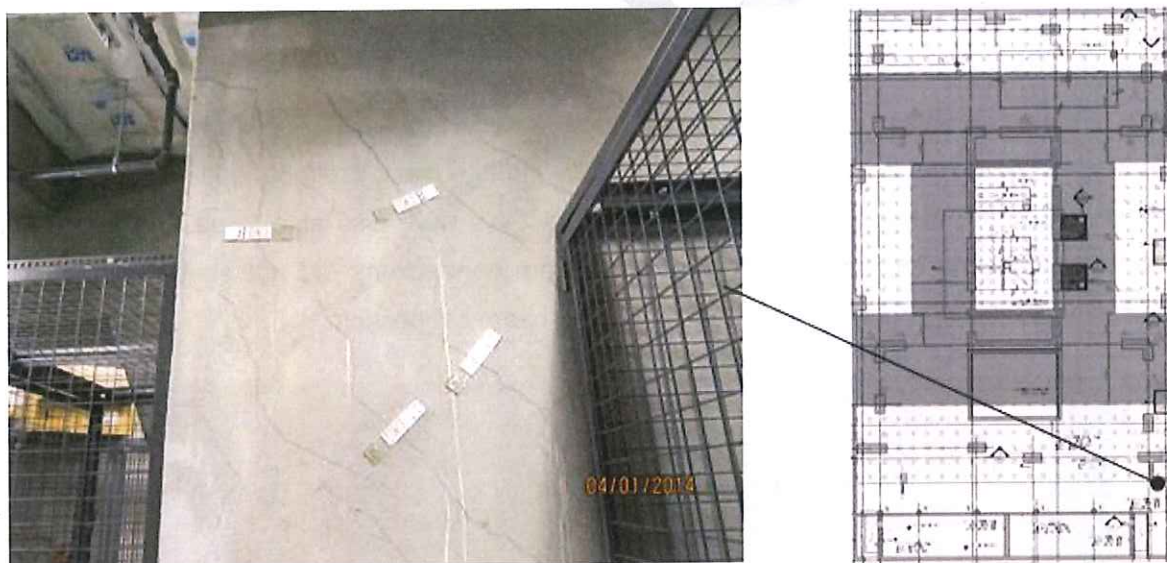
Shear crack at beam-column joint, Line H
